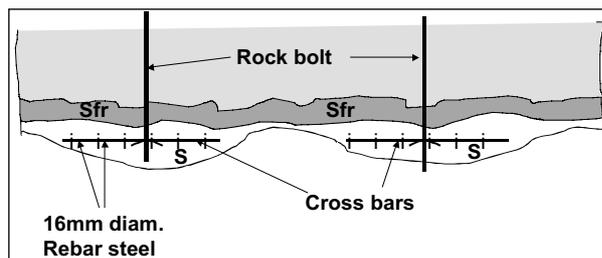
Principal sketch of two reinforced ribs of sprayed concrete with one layer of reinforcement (Grimstad et al 2002)
